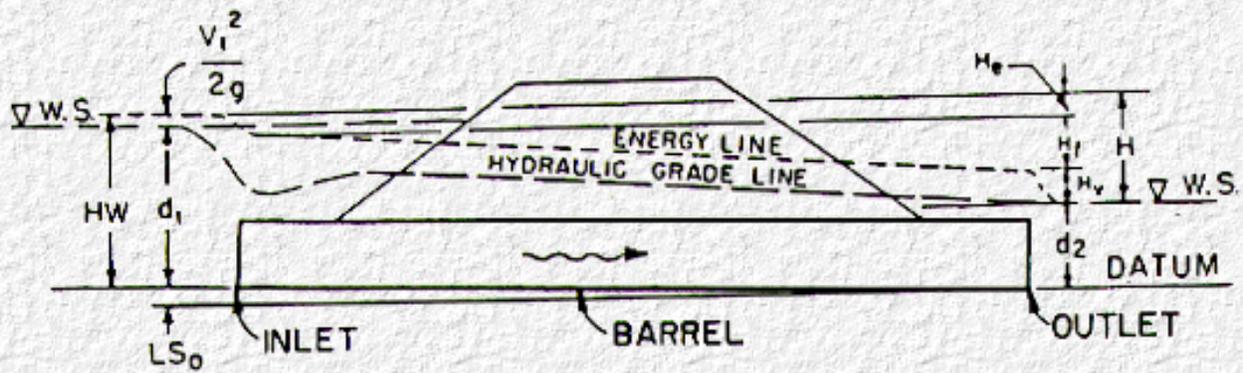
Hydraulic and Energy Grade Lines in Culvert Flow.
